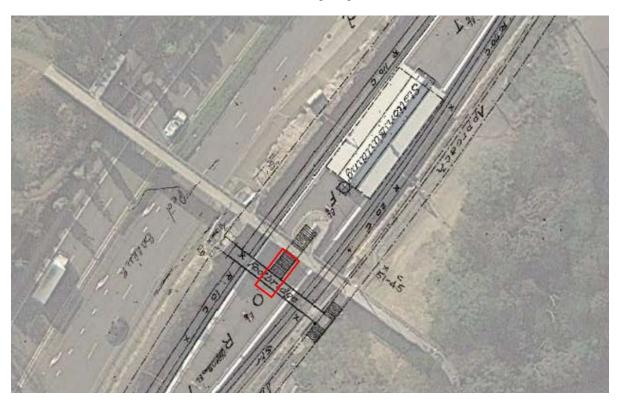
Overlay of 1924 railway plan of Faulconbridge Station. Location of former stairs indicated in red.
